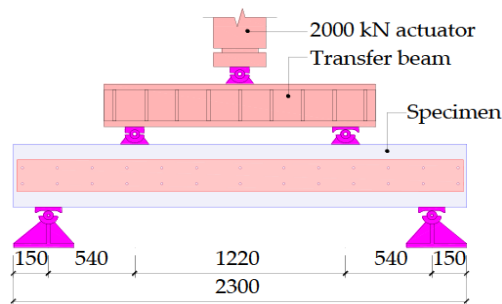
Test arrangement of the beam specimens subjected to loading in a testing press for investigating the shear strength of their cross-sections in the study by Xin Liu et al. (2018) [28].
